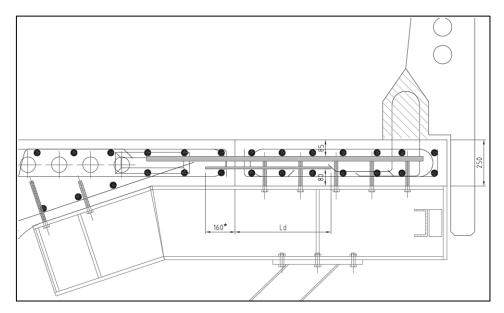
Caption of Embedded Reinforcement (dimensions in mm)
